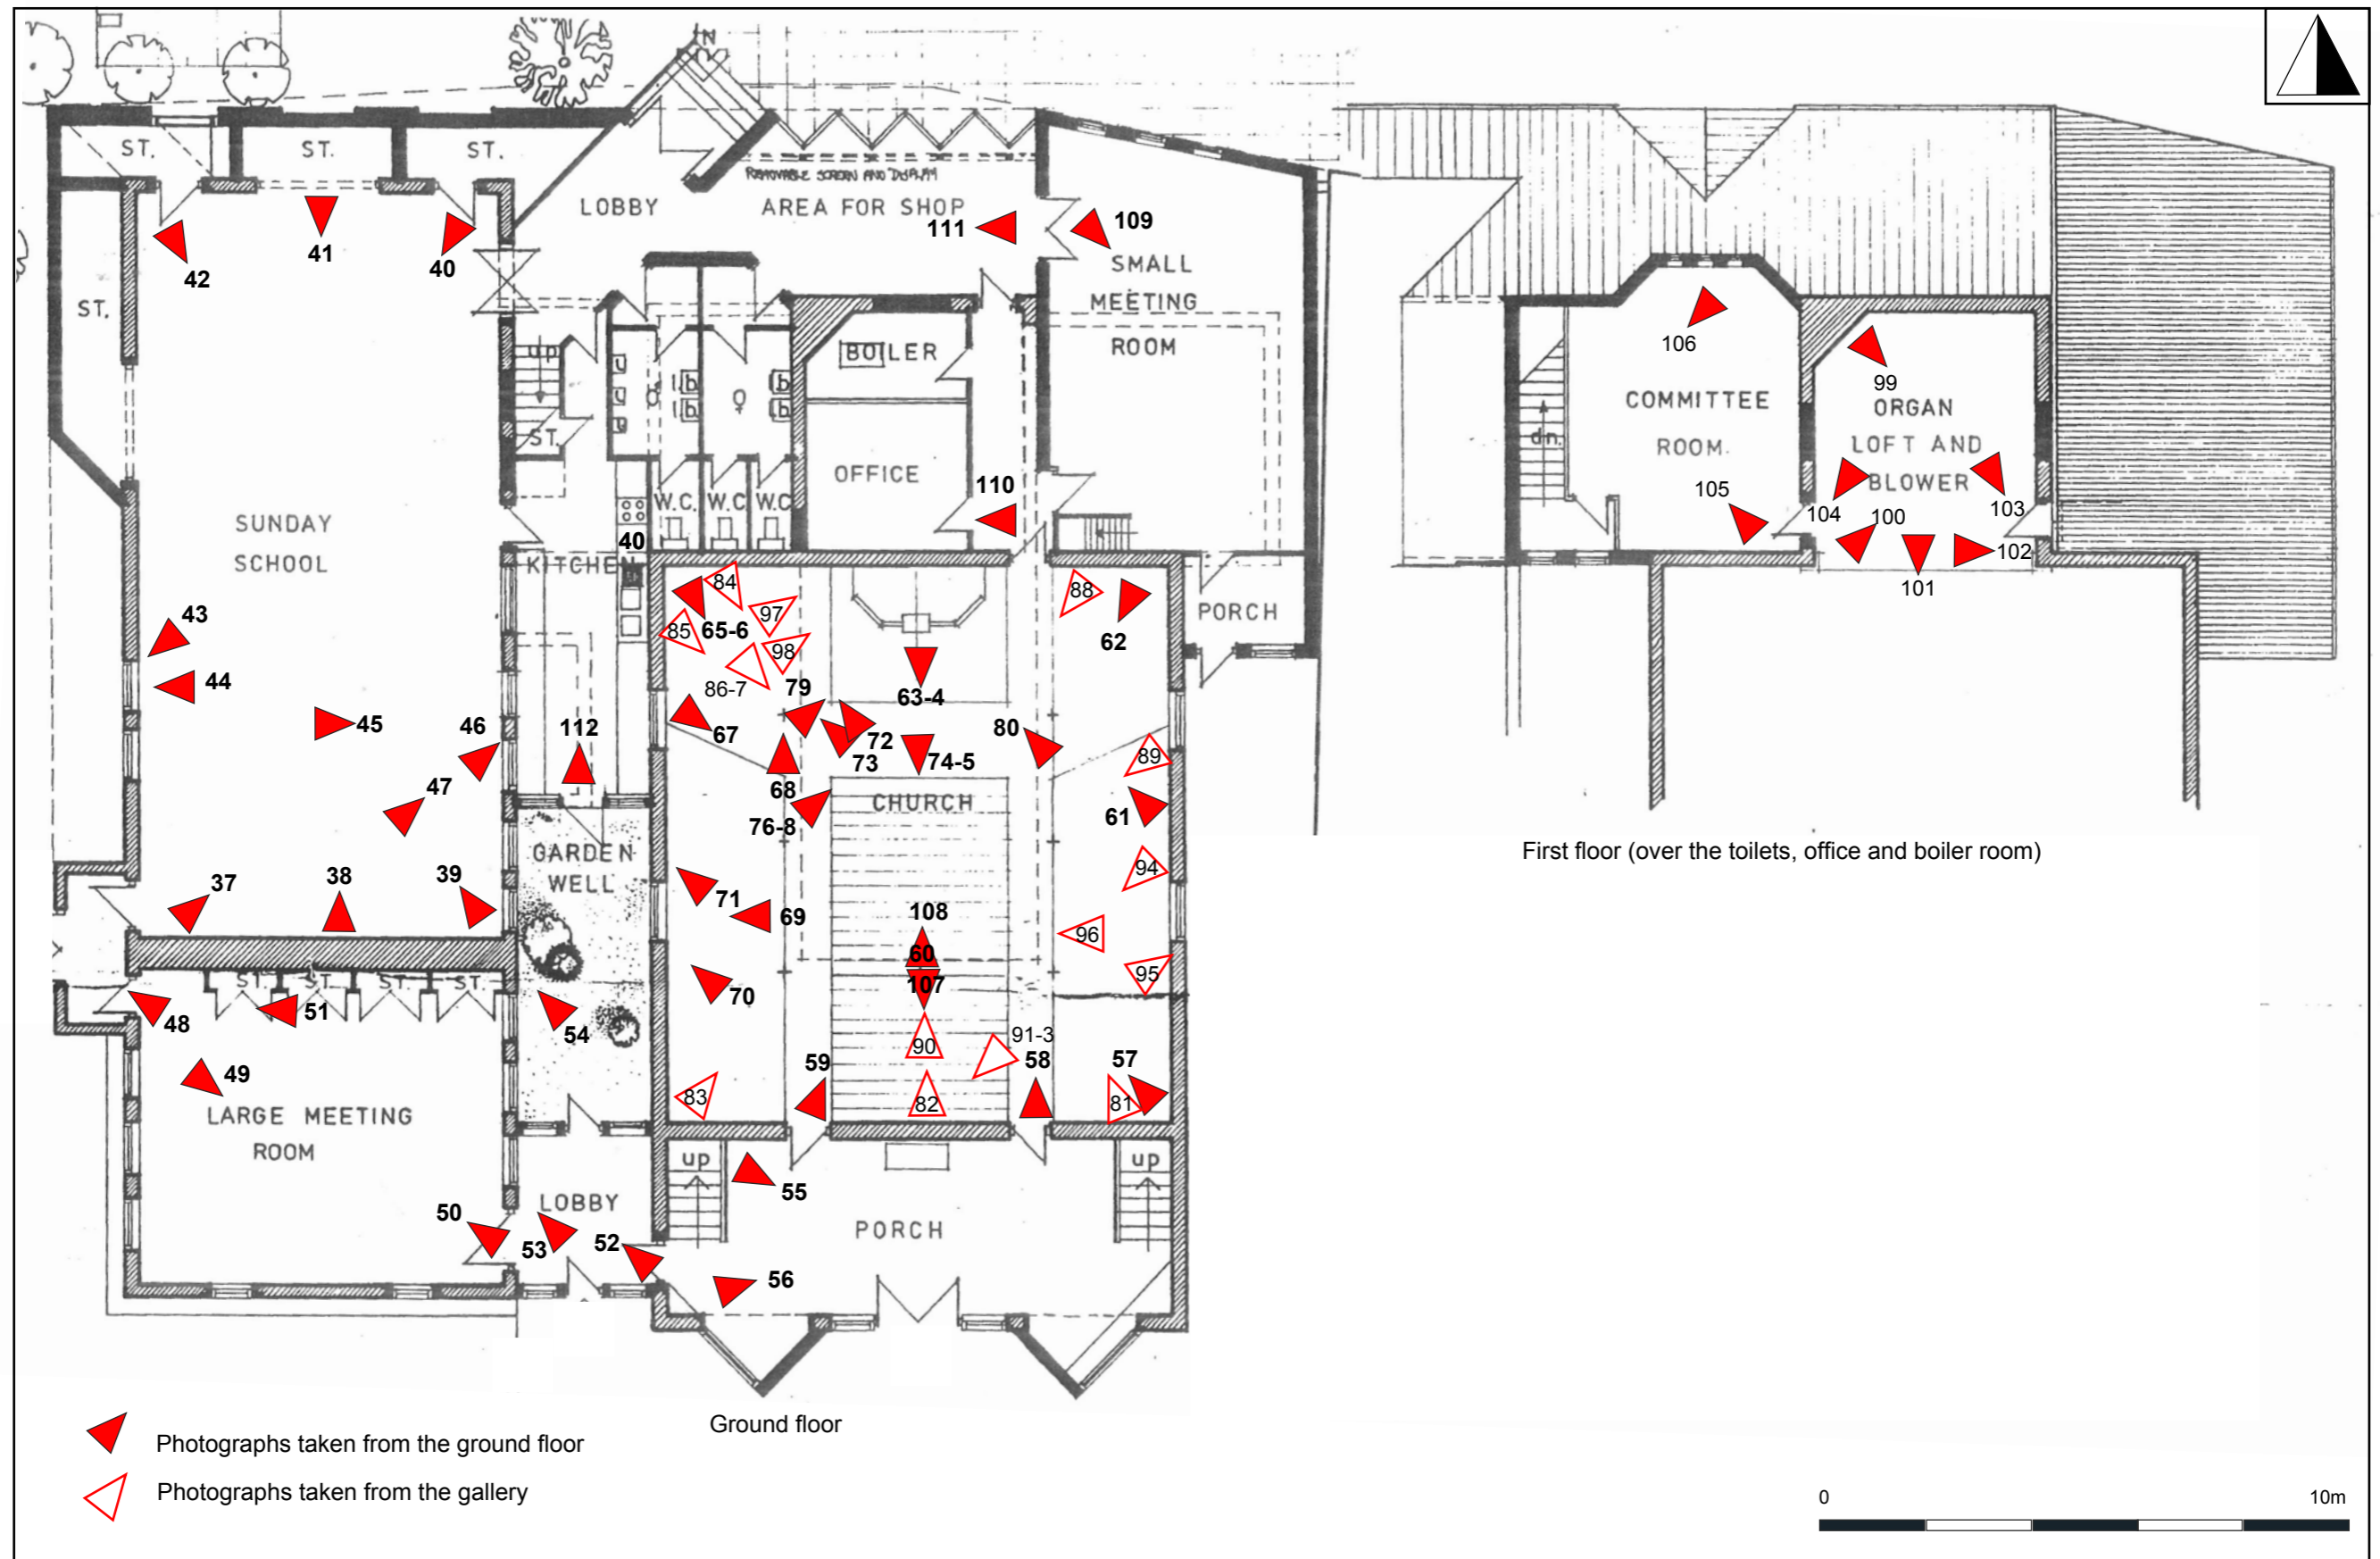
Bingham Methodist Church, Bingham, Nottinghamshire. Ground and first floor photographic viewpoints. (Scale 1:250 at A3)
